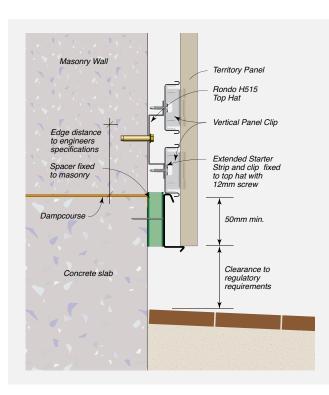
Base Detail - Concrete Slab Construction - Plan View
